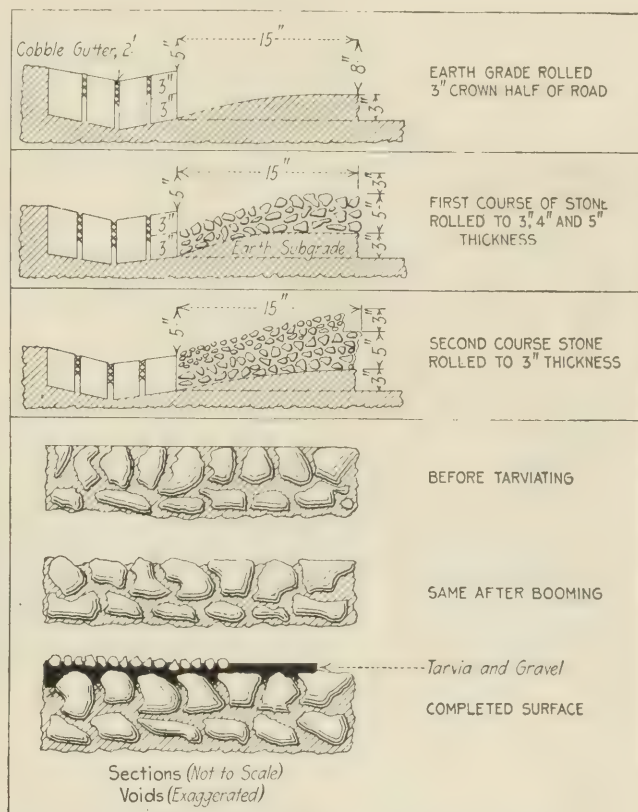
CROSS-SECTIONS SHOWING CONSTRUCTION OF BAYONNE PARK ROAD
